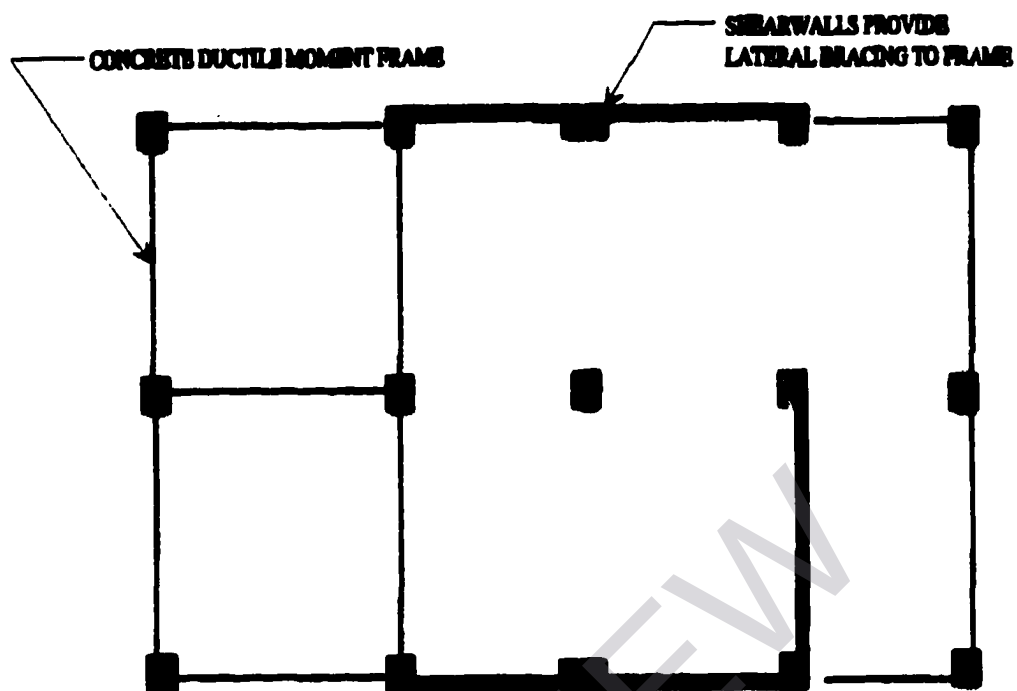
Category 1: Ductile Moment Frame, Shear Wall Floor Plan
